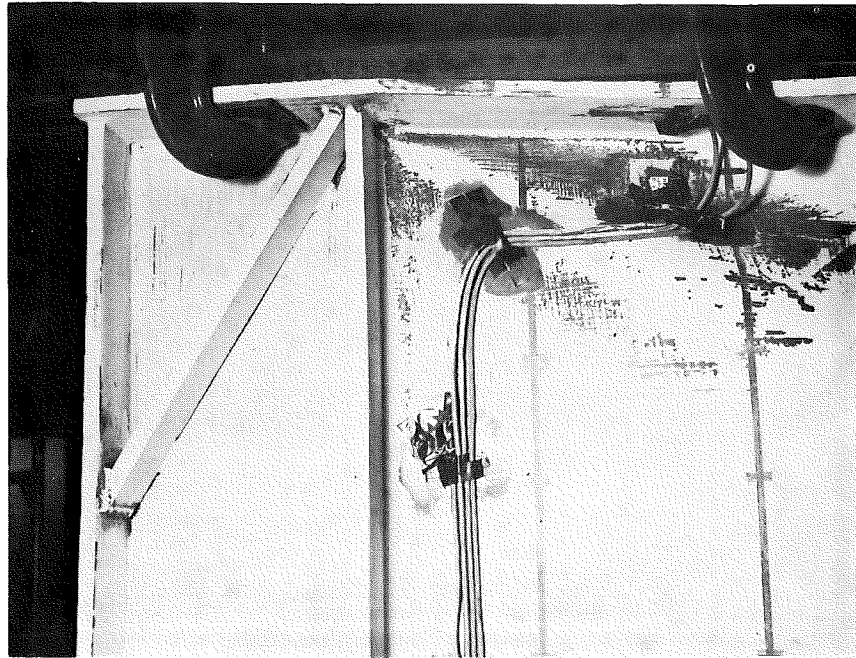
Top Flange Failure and Reinforcing of Compression Flange (UG4.1)
